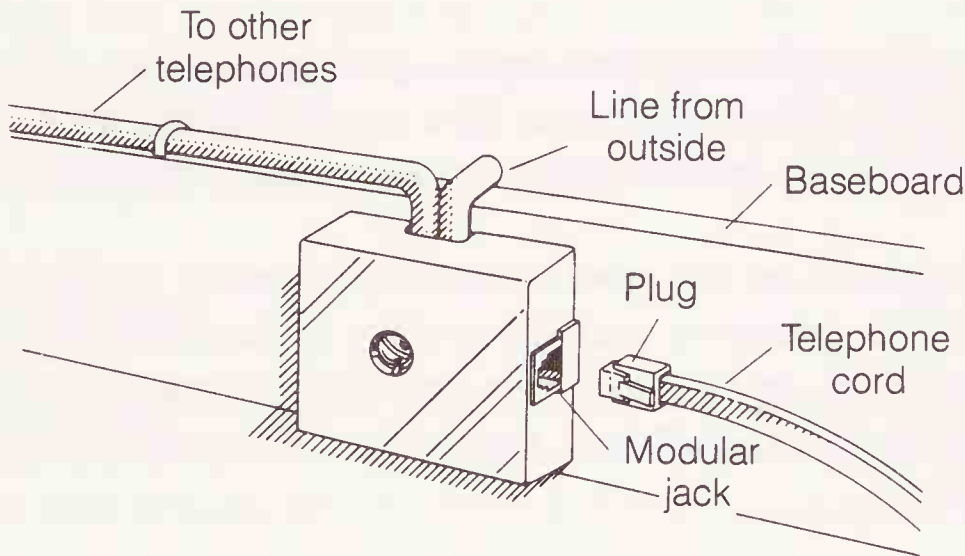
Adding a new modular outlet. The outlet can tap into a nearby line or you can stretch new cable from a distant outlet. (Reprinted from Installing Your Own Telephones, 3rd Edition. © 1989, Master Publishing, Inc.)
